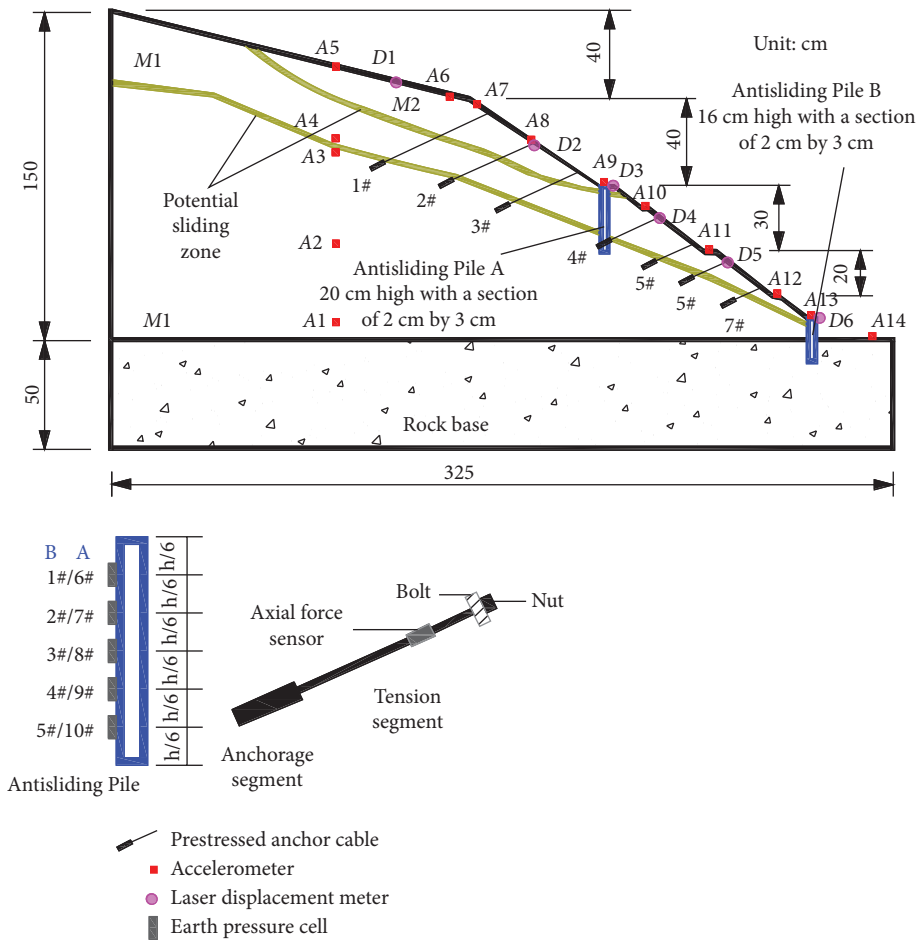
Layout of sensors and detailed views of the antisliding pile and prestressed anchor cable.
